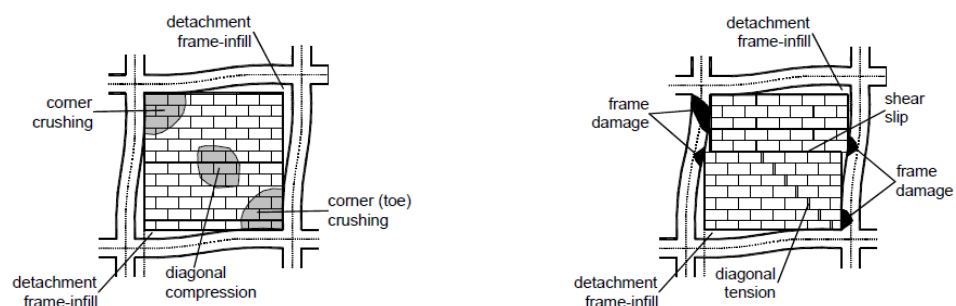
Modes of failure of masonry in-filled frames P. G. Asteris et al. (2011)
